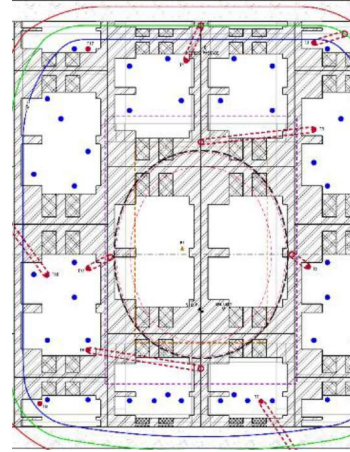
Arrangement of freezing pipes and monitoring instrumentation
